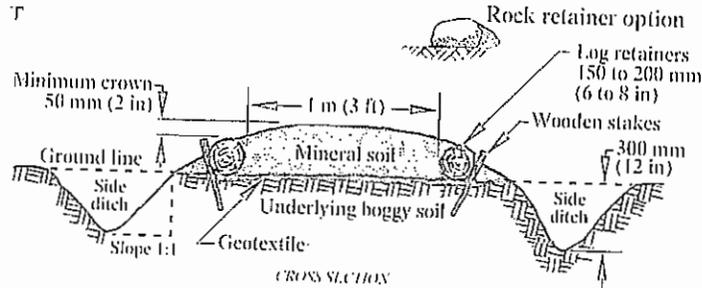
Place geotextile under the retainer logs or rocks before staking the geotextile in place.
